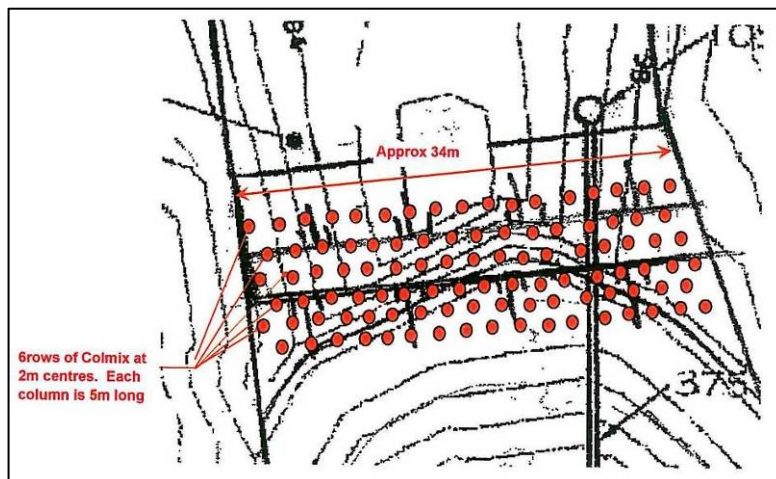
Plan of final Colmix DSM column arrangement underneath the bund
